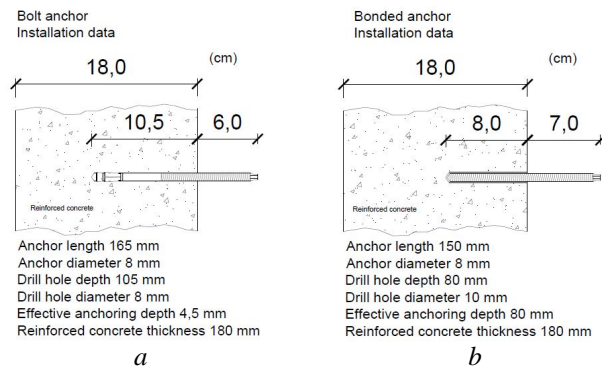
Installation of *a* – bolt anchor and *b* – bond anchor in reinforced concrete specimen.
